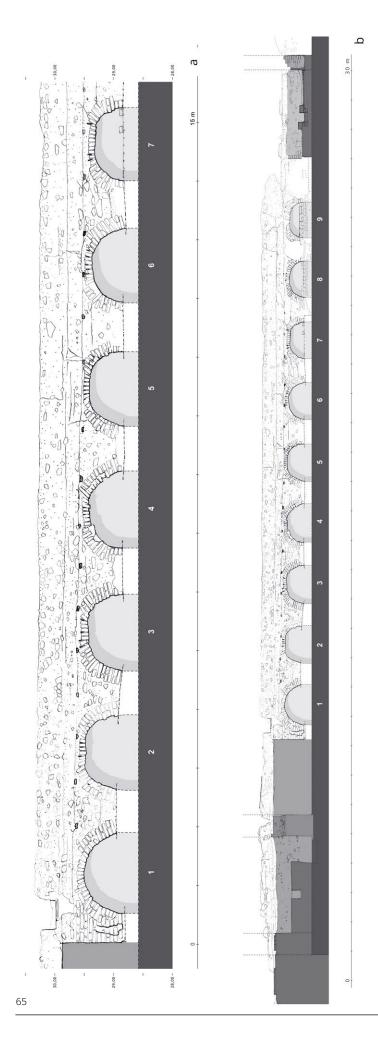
Monteagudo, aqueduct. Elevation drawing the second segment.
